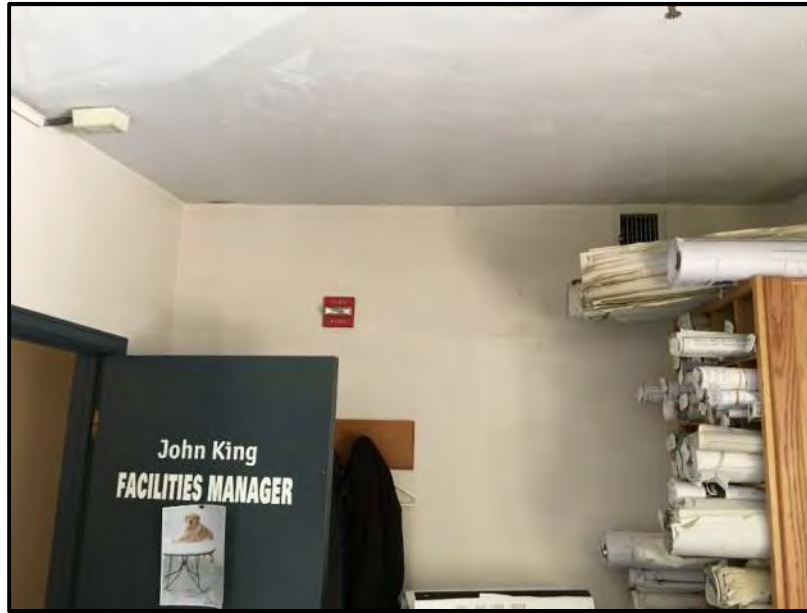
Crack Between Ceiling and Wall in Mezzanine Office
